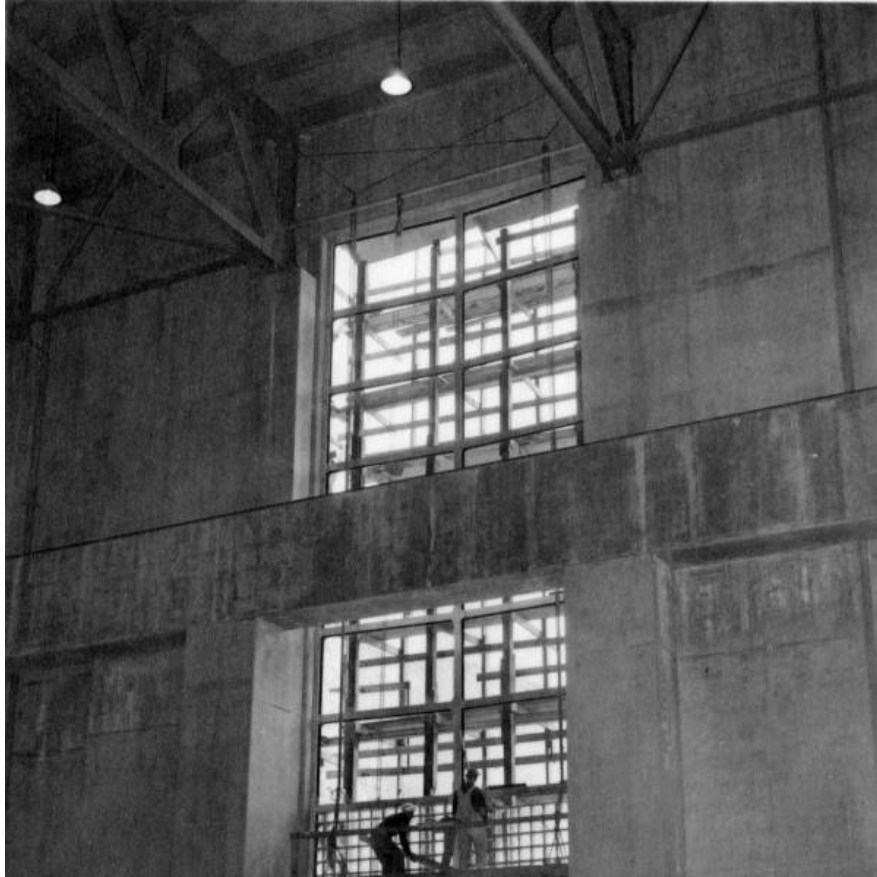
Construction of West Powerhouse windows, photographed 1942 (photo from the Digital Collections of Washington State University)
